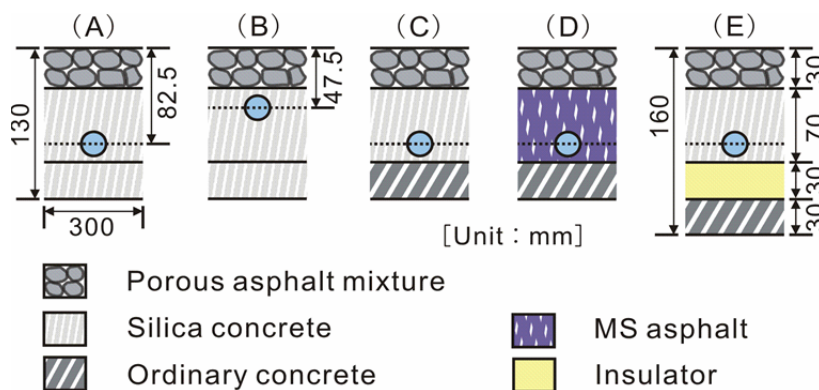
Cross sections of specimens for hydronically-heated bridge road
